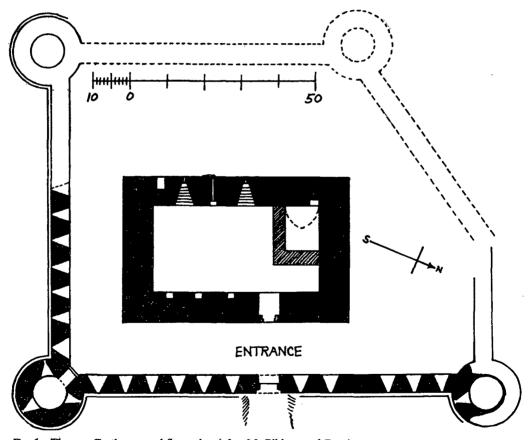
Threave Castle, ground-floor plan (after McGibbon and Ross)
